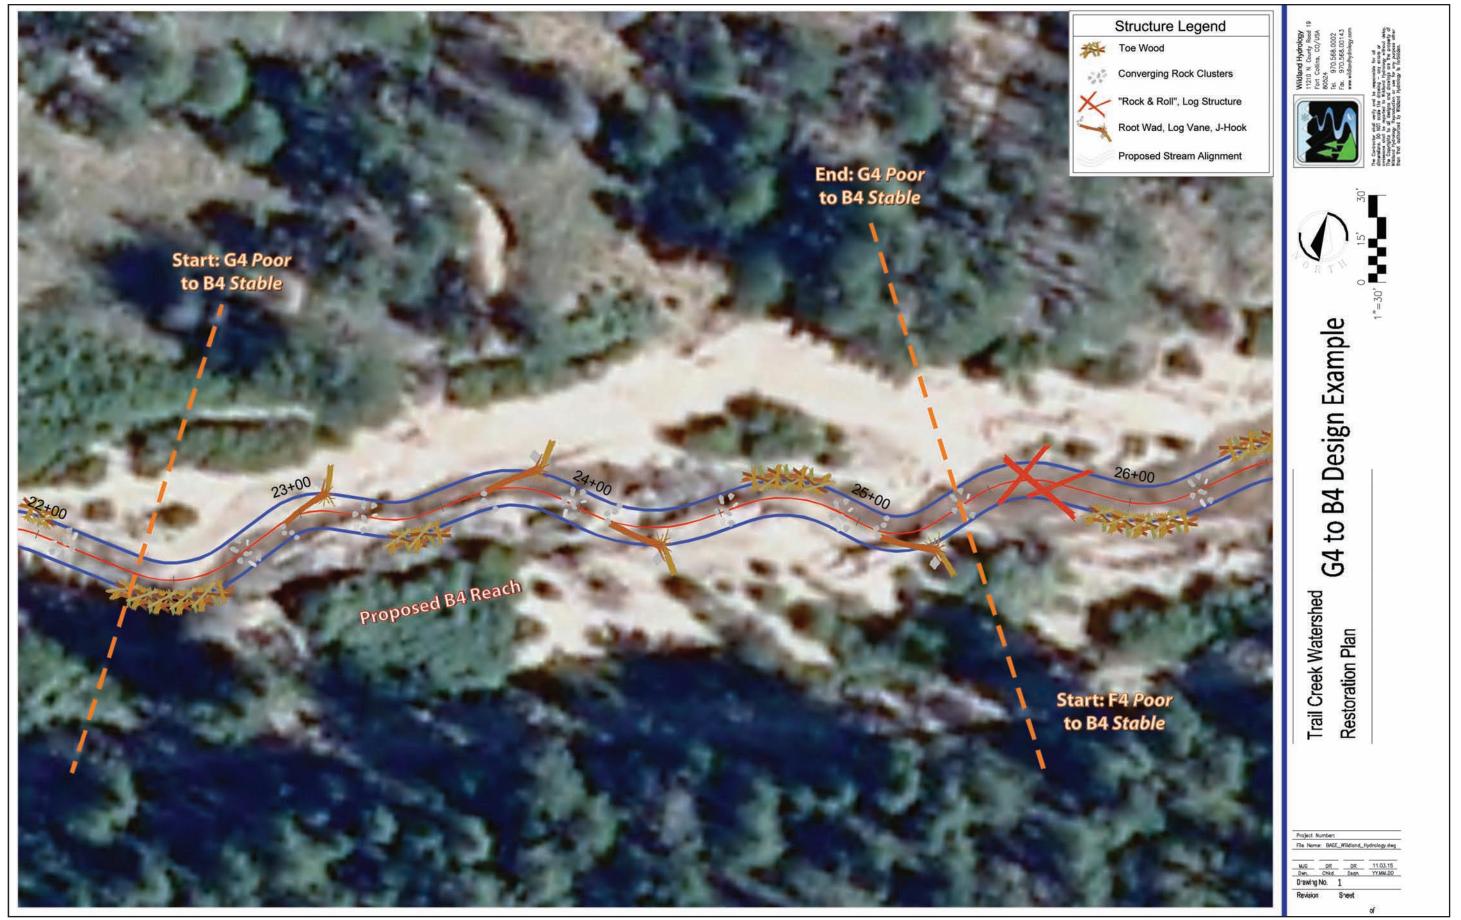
The proposed plan view layout of the G4 to B4 conversion depicting the stabilization and fish enhancement structures.
